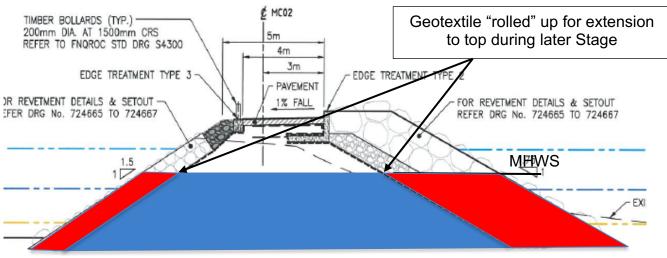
Stage 2 Existing Breakwater Reconstruction
